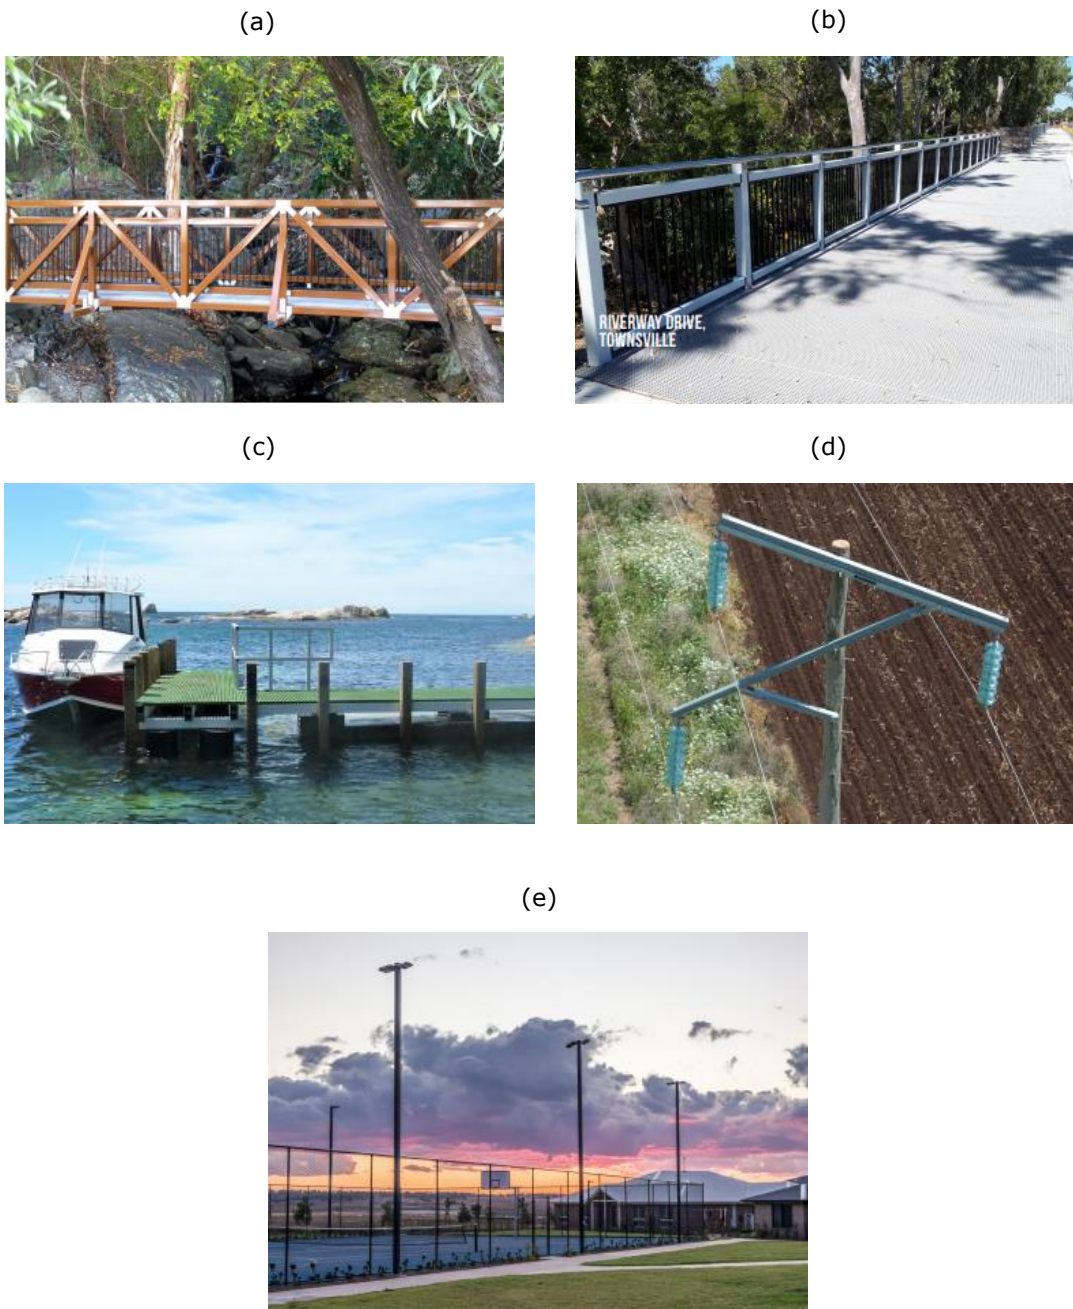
Applications of GFRP profiles; (a) pedestrian bridges, (b) boardwalks, (c) marine infrastructure, (d) crossarms and (e) light poles [140]
